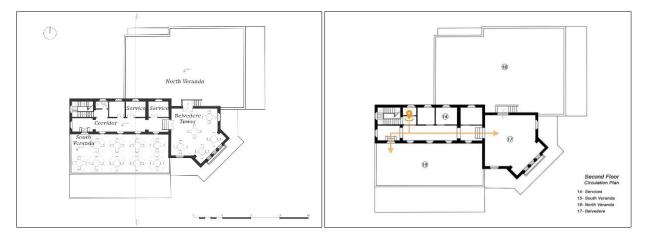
Second Floor Plan Permanent Scenario Plan (left) and (right) Circulation Diagram (© Dorel Habili).
